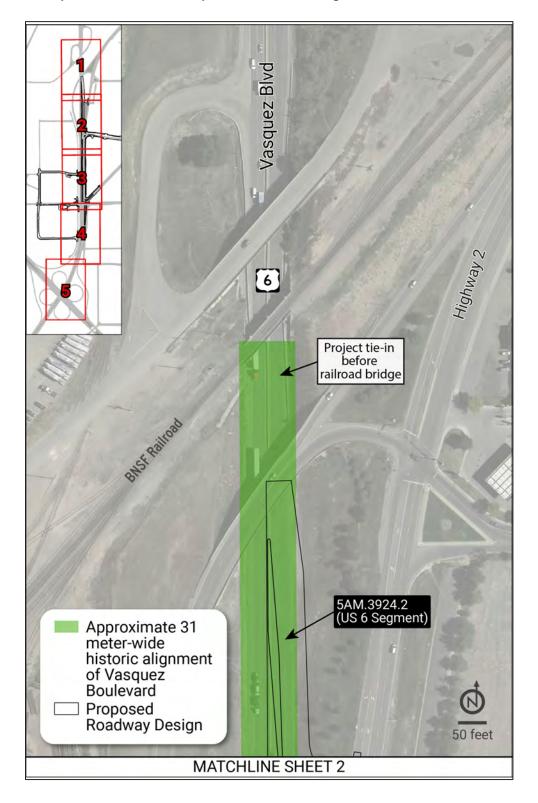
Vasquez Boulevard Proposed and Existing, Sheet 2
